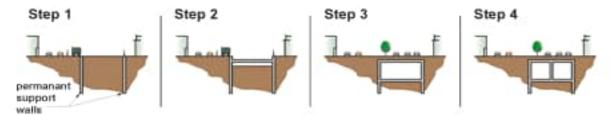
Top-down Cut and Cover Construction [P-74]
